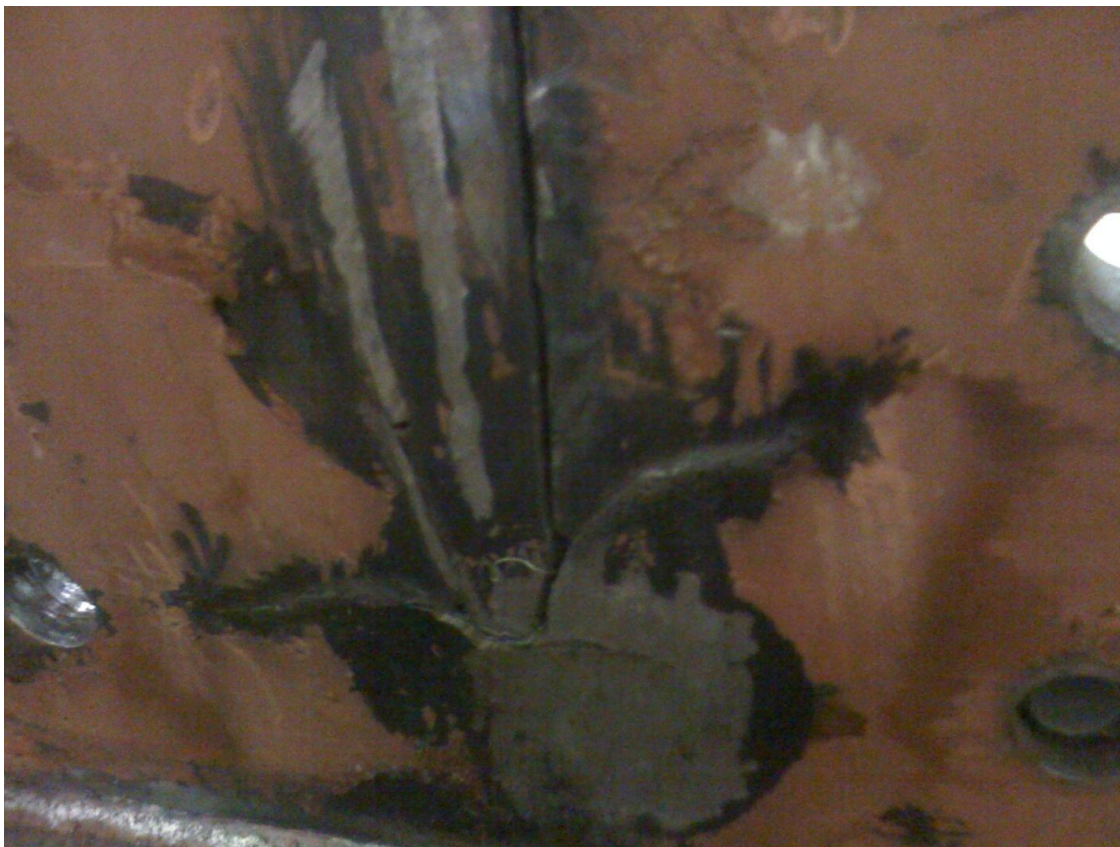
Existing cracks on exterior face of the girder's web
